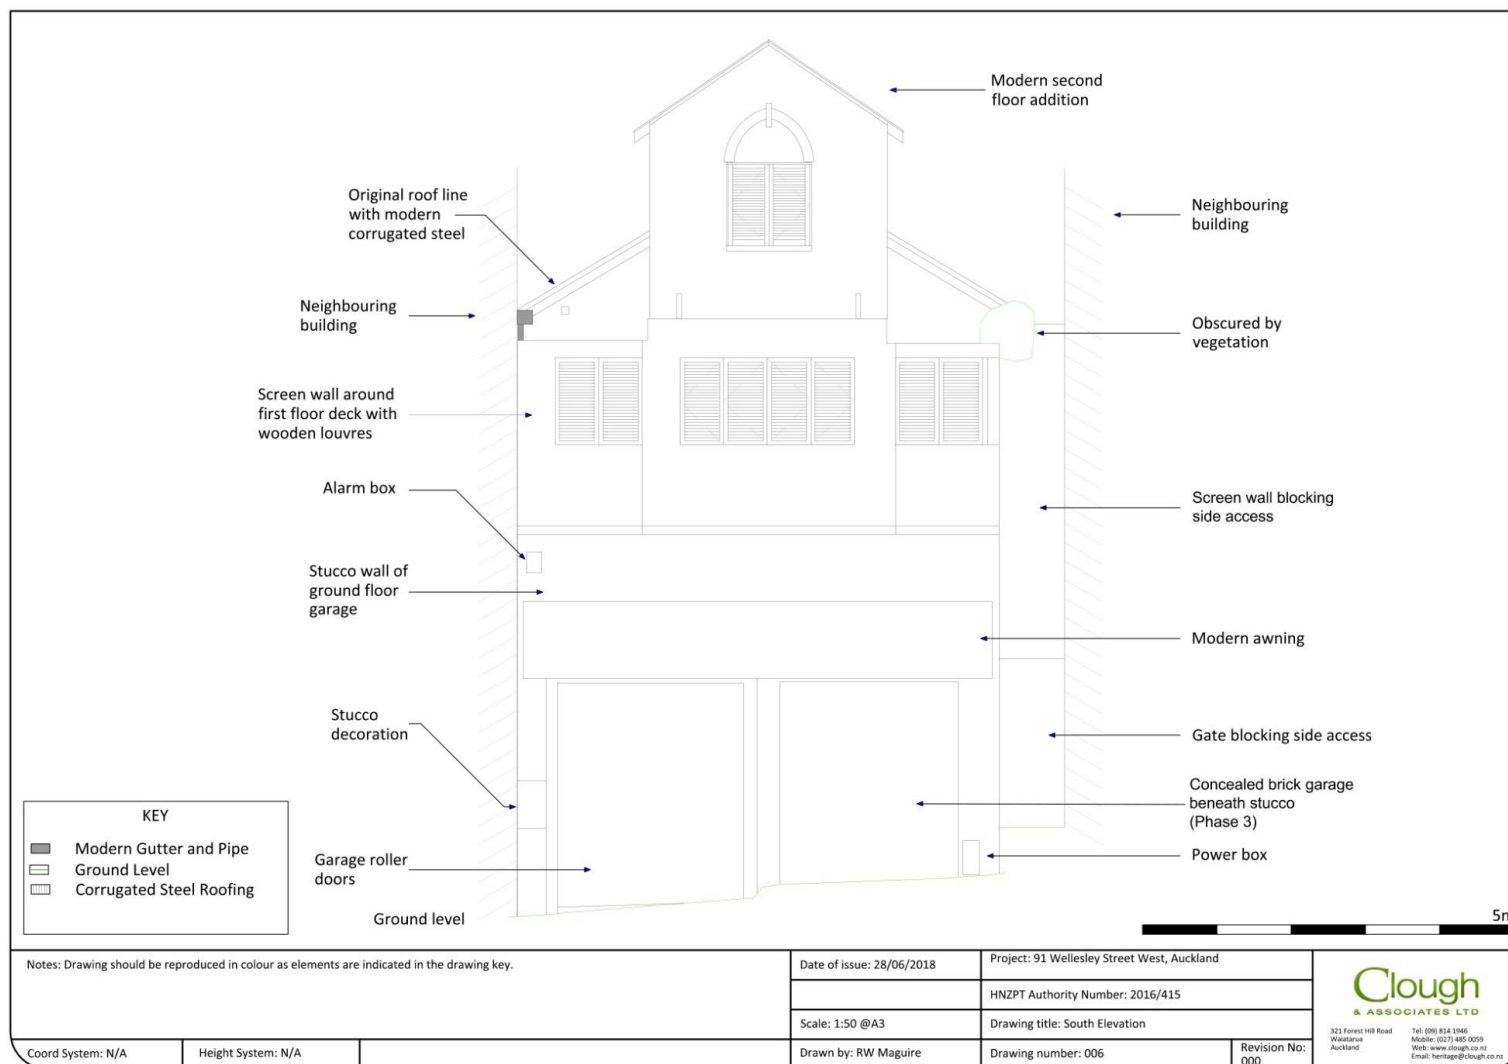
Front (south facing) elevation of 91 Wellesley Street West (source: Clough & Associates, 2015)
